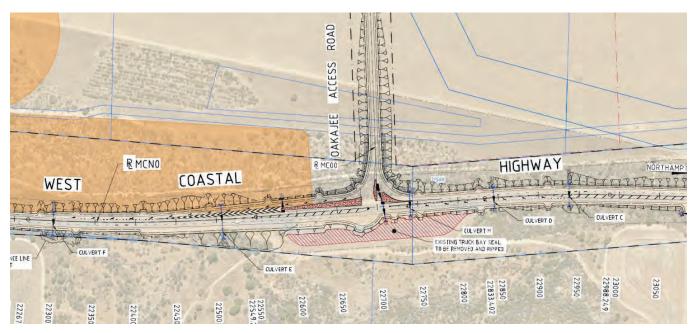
NWCH/OIE intersection – under construction (Source: Main Roads WA September 2024)
